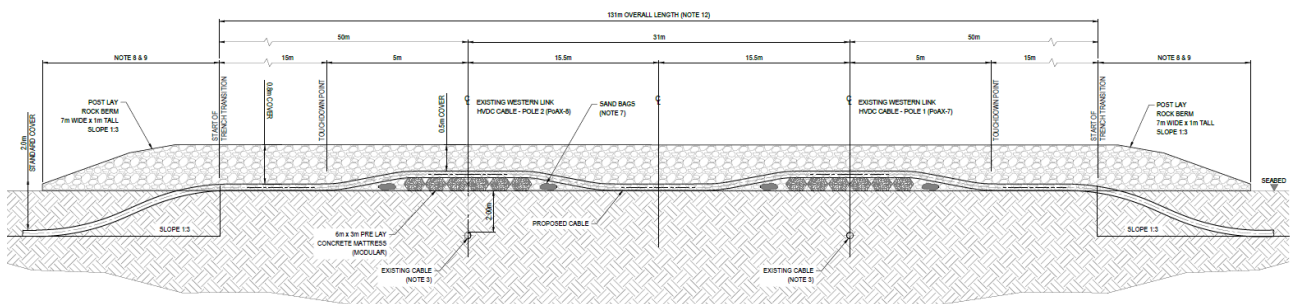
Typical Schematic Layout of Rock Berm Protection at Cable Crossing
